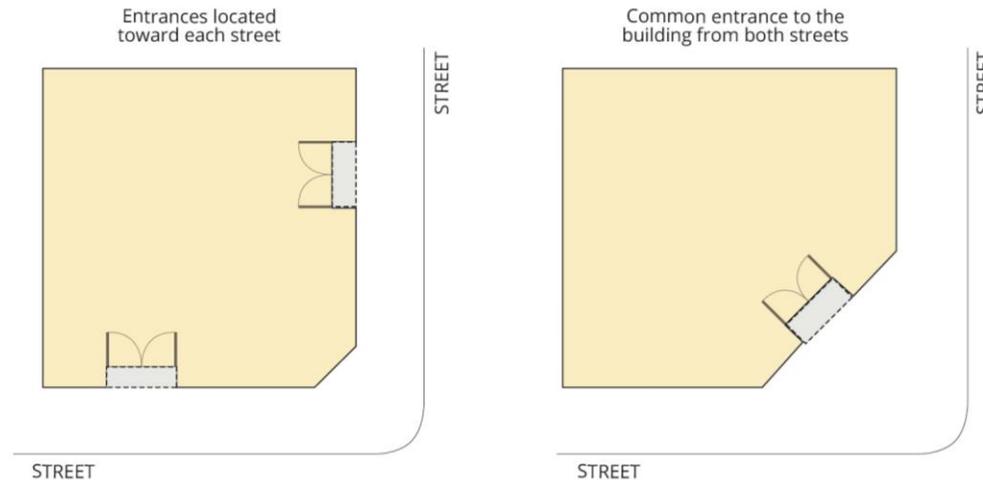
B GROUND FLOOR NONRESIDENTIAL USES, CORNER BUILDINGS ENTRANCE DESIGN
